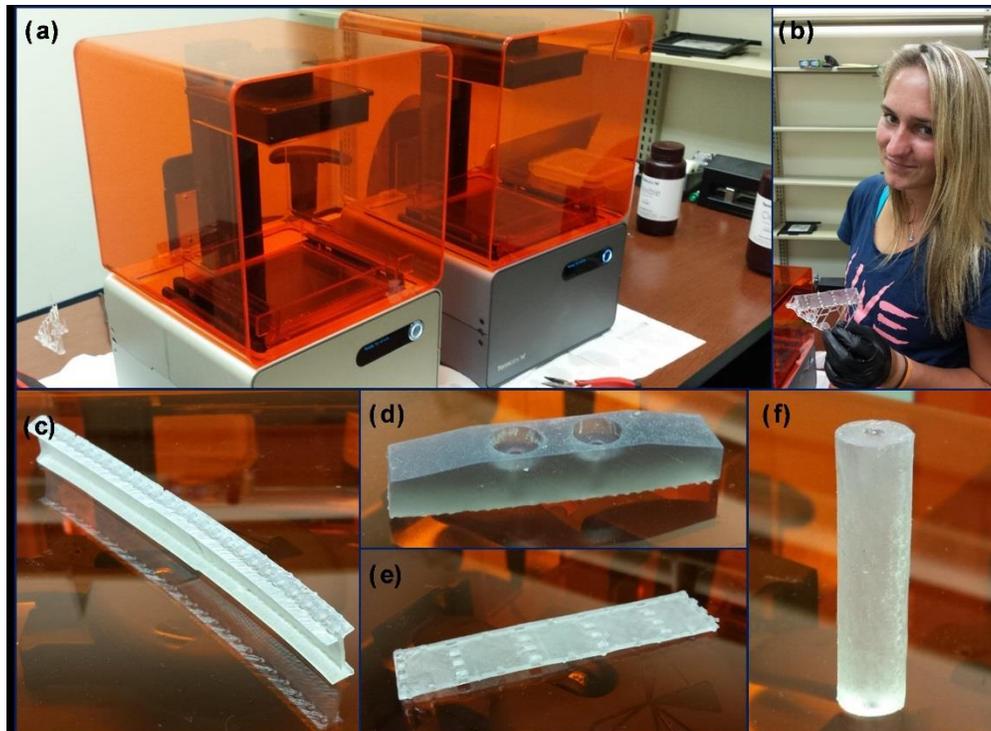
A small scale ABC study through 3D printing of bridge elements (a) 3D printers used for the study (b) Research student holding a 3D printed bridge element (c) girder (d) column cap (e) bridge deck (f) column
